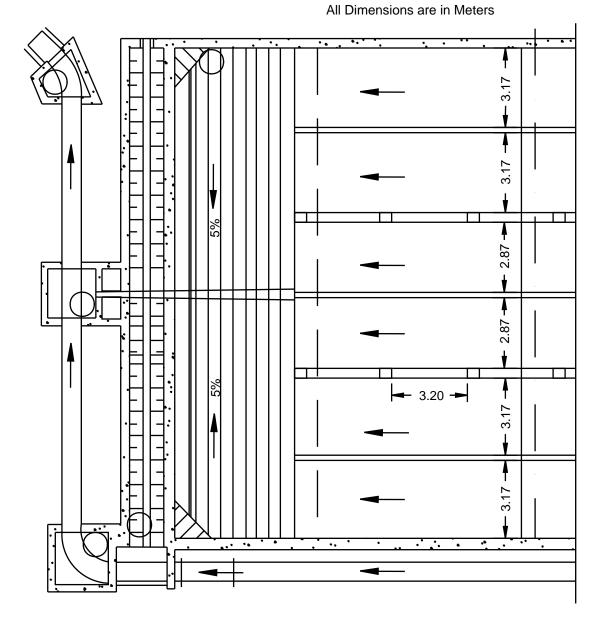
Stadt-Essen - Plan View, Tank Effluent
